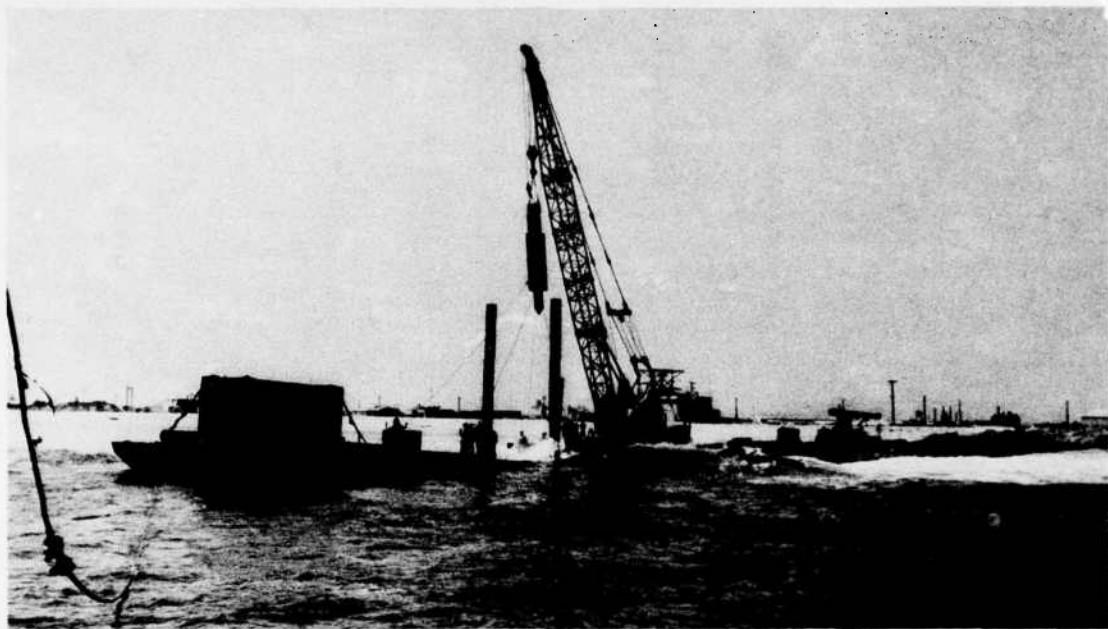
Placing and driving pile during 6-foot (1.8-m) wave.
